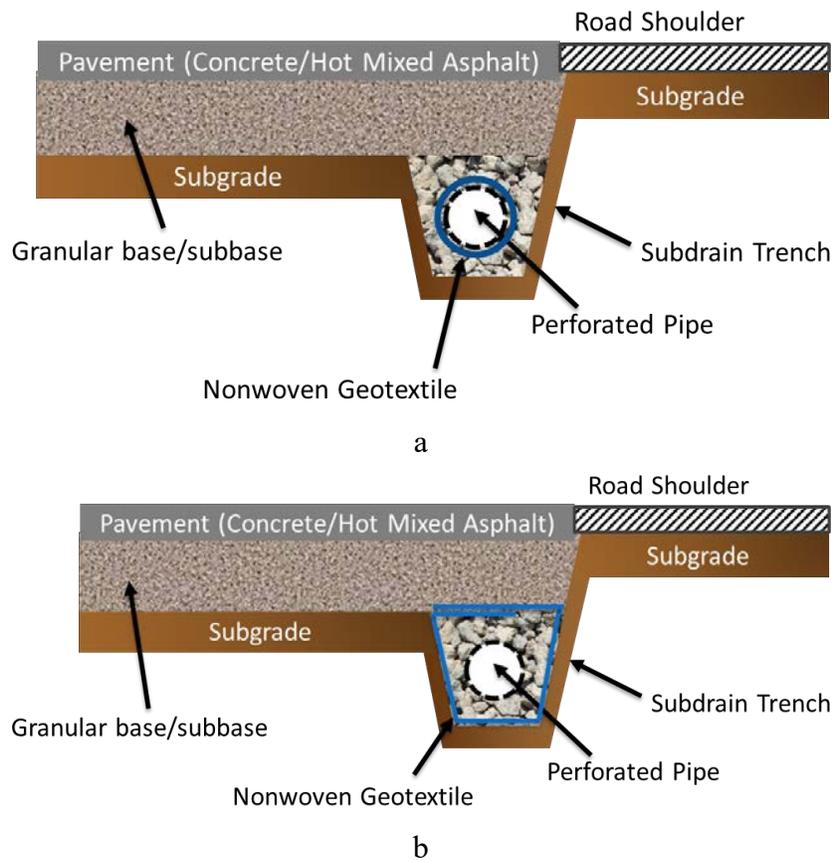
Typical cross-section of a roadway with side-drain with, (a) old and (b) new design of underdrains
